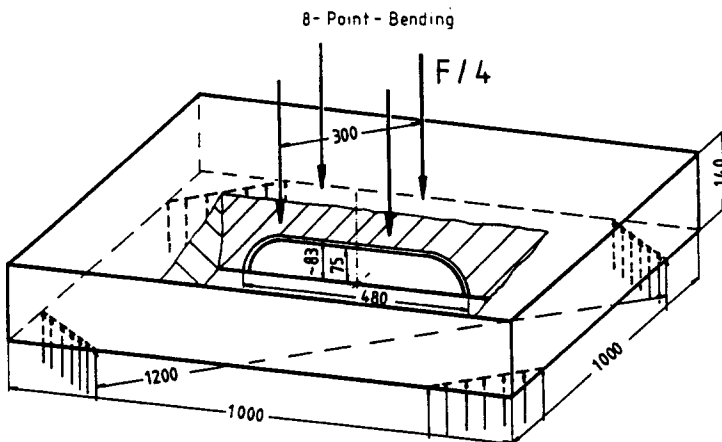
Plate under 8-point bending, dimensions and load configuration of the structure.
